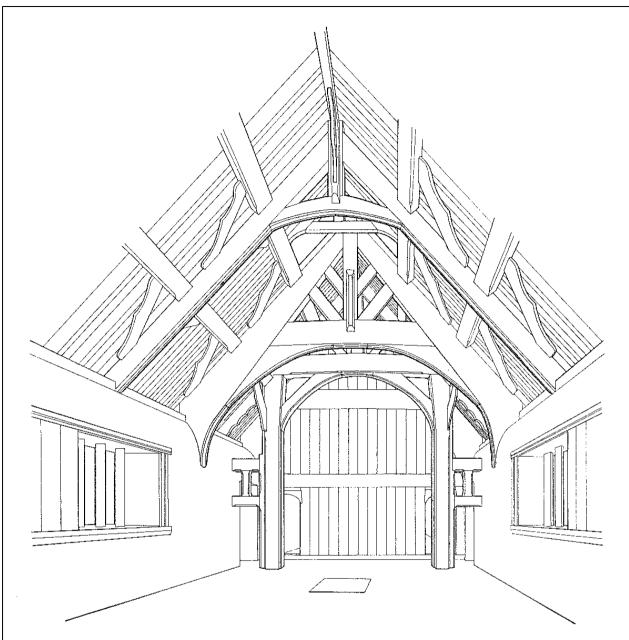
The interior of Plas-ucha looking towards the passage reveals some of the splendours and discomforts of medieval life: the fine roof, the open hearth, the louvre opening in the roof, the unglazed windows. The construction is mixed, box-framed aisle truss and cruck-framed central truss, the disparate elements linked by the general use of a king-post to carry the ridge. (Pls. 22–23)
